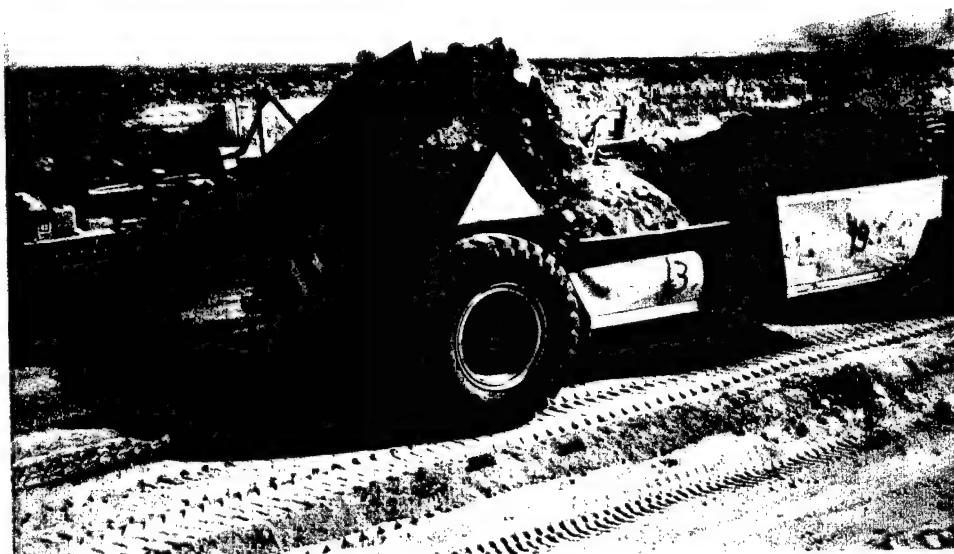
Holland side cut excavator loading a Holland Wagon. 7 Jan. 1991
